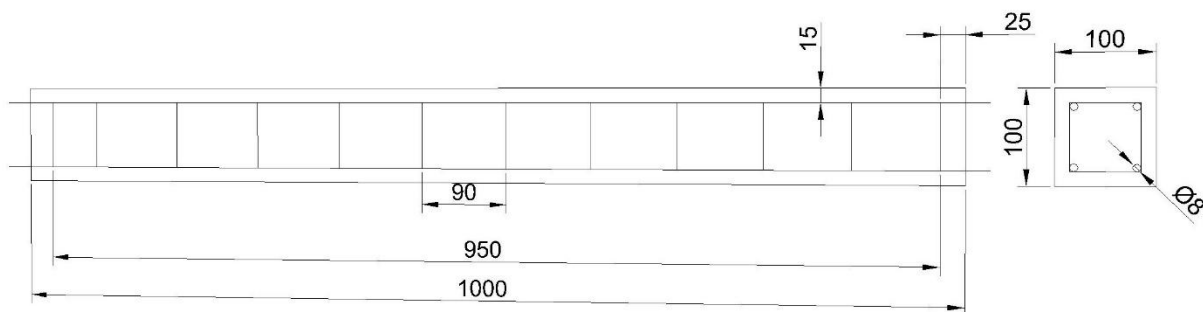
Reinforcement details of corrosion induced beam
